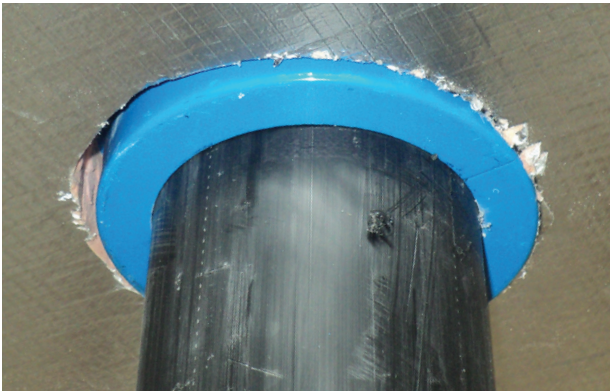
Penetration example - Kingspan Kooltherm® K10 PLUS Soffit Board installed tight around the fire collar and HDPE service pipe.
